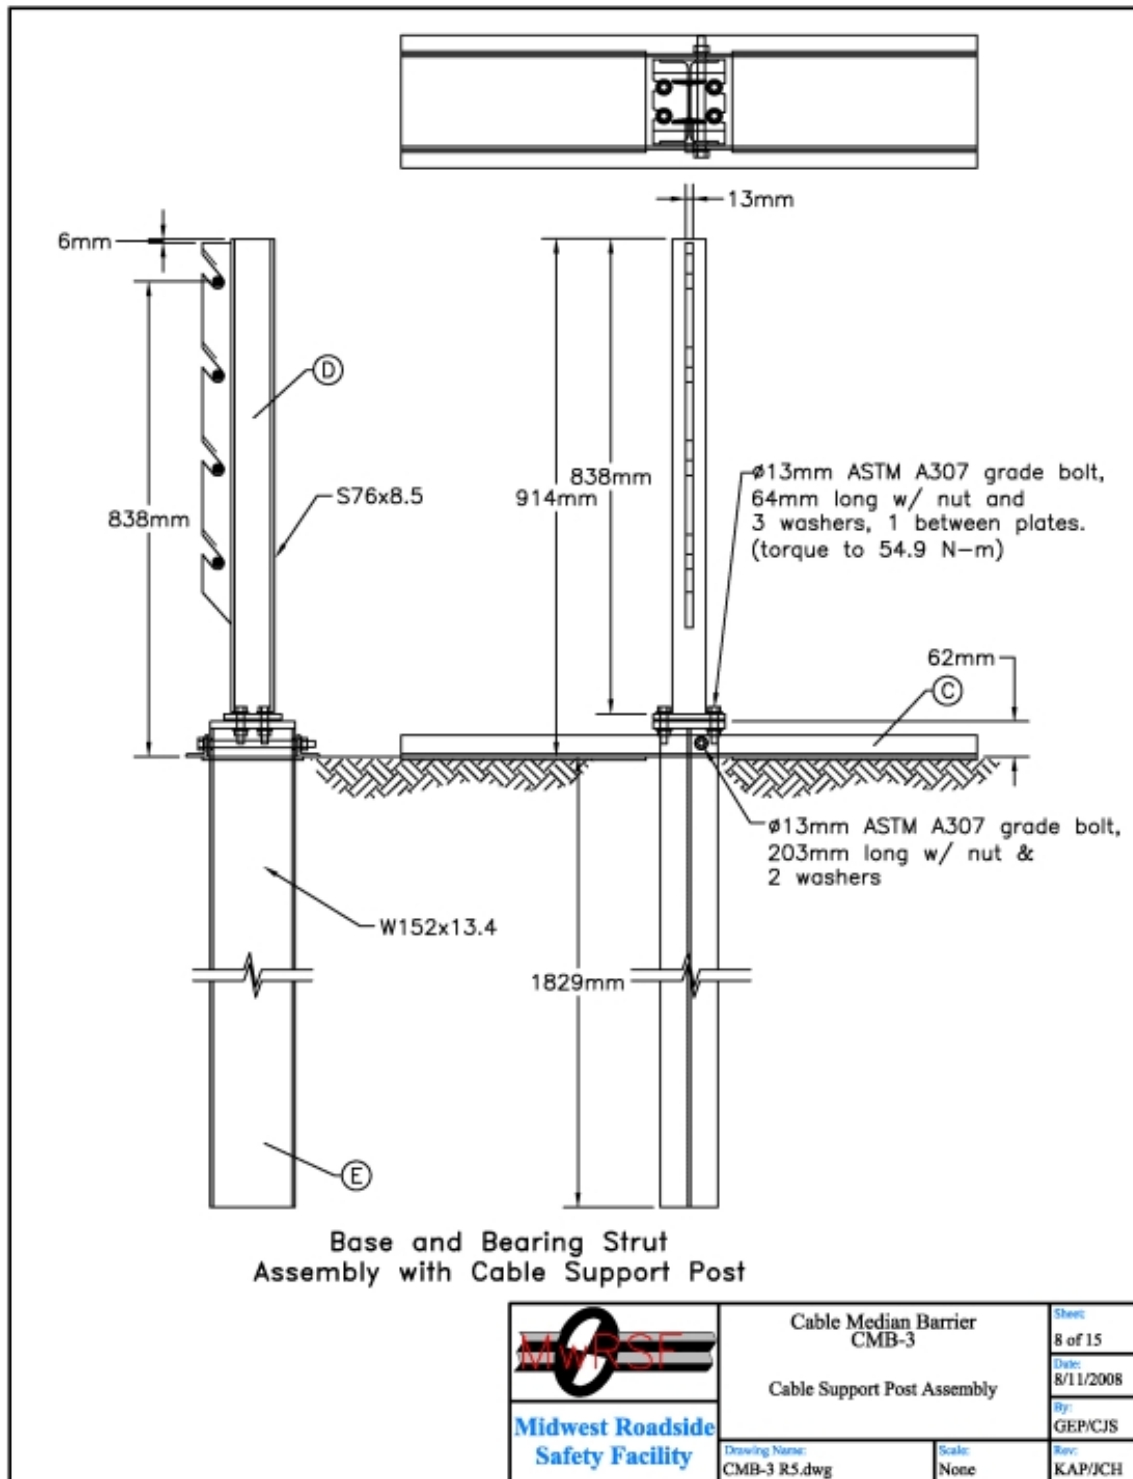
Cable Support Post Assembly (Metric), Design No. 3
